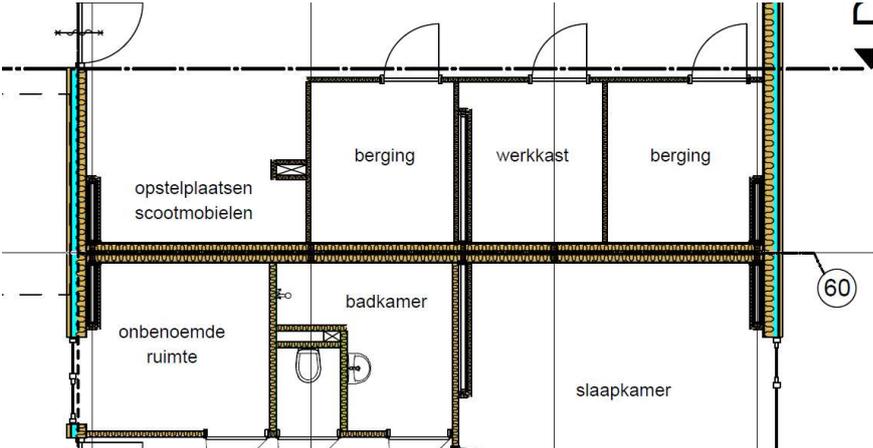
Location of bracings in floor plan (Pieters Bouwtechniek).
